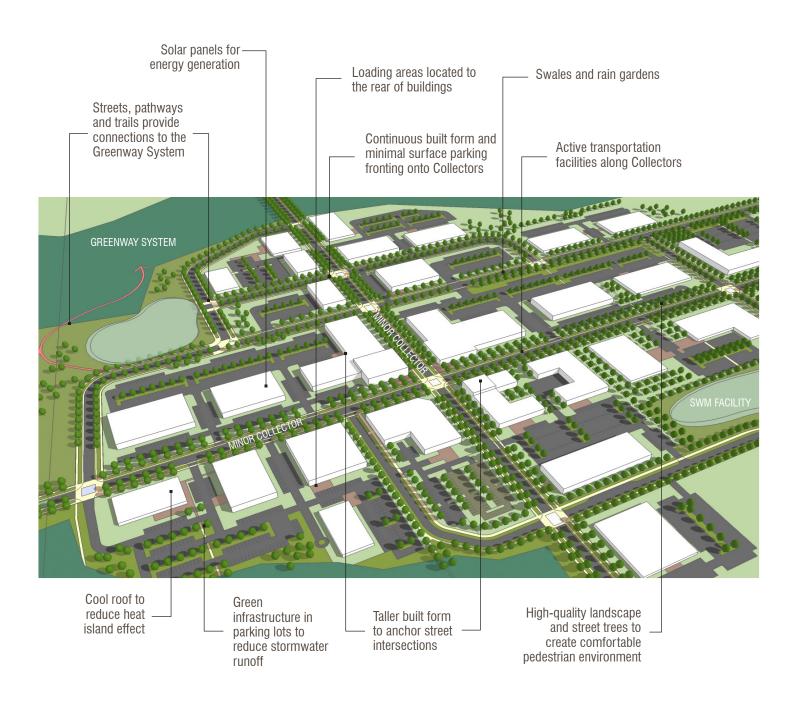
Demonstration plan illustrating key organizing elements and built form vision for Employment Area
